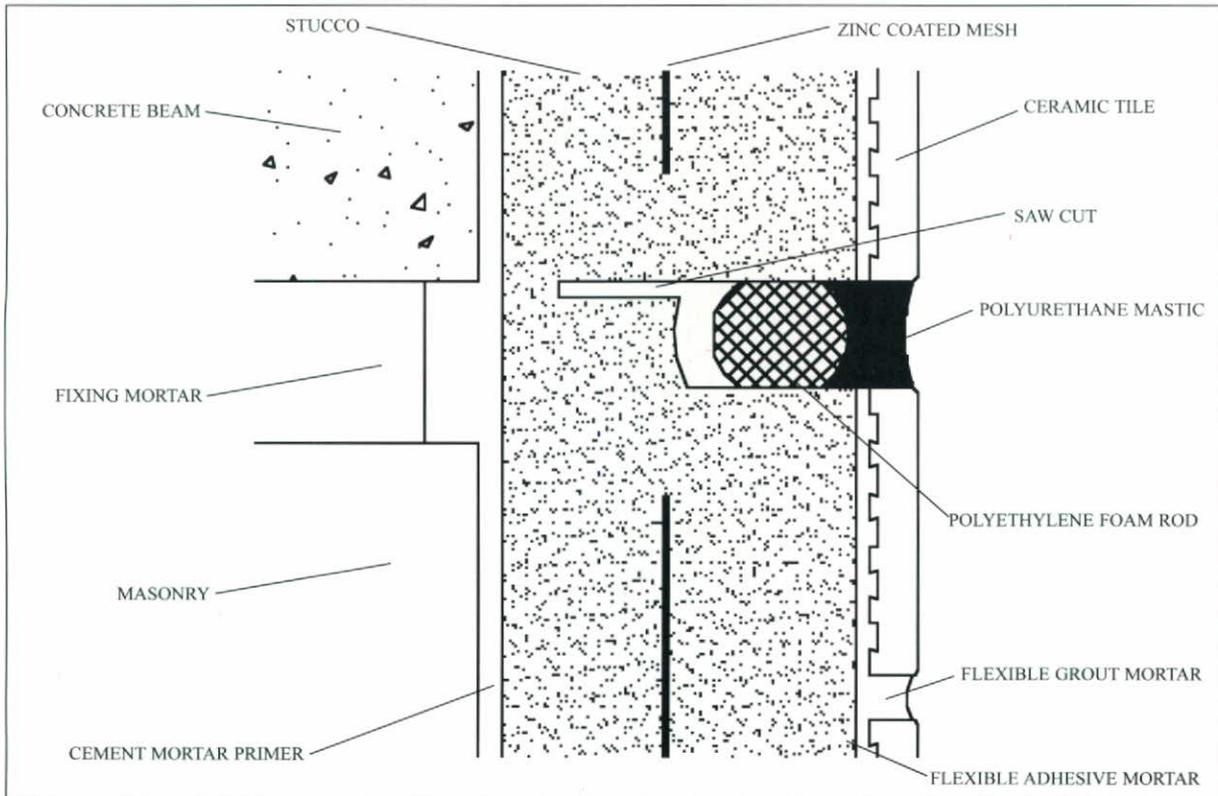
Detail of horizontal control joint for an extruded stoneware tile façade.
